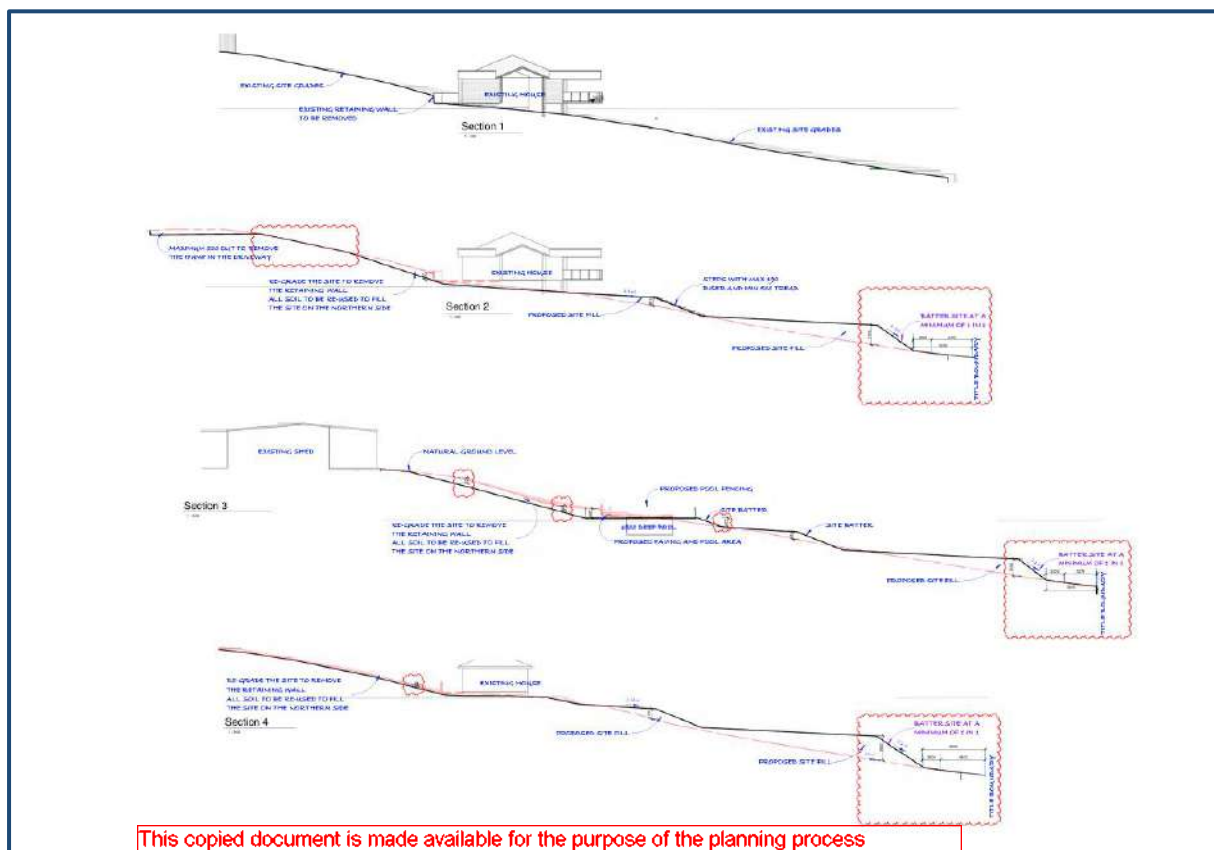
Sections of proposed earthworks. Section 1 shows the current slope of the land.
